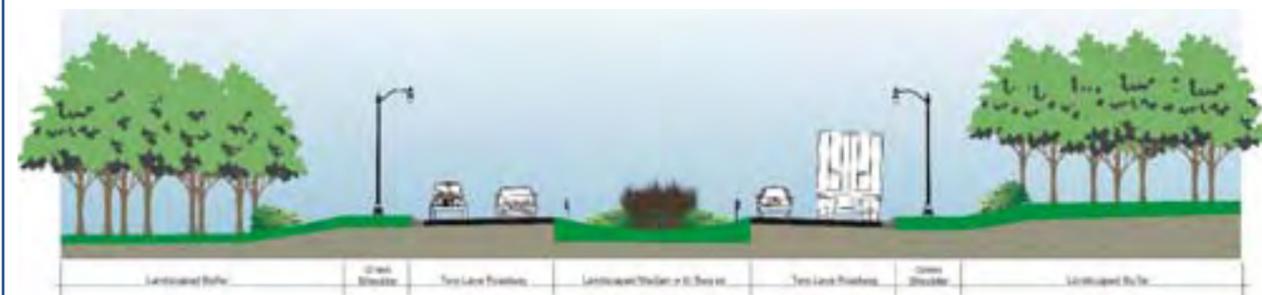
Typical Cross-Section Between Pennsylvania Avenue and East Capitol Street
